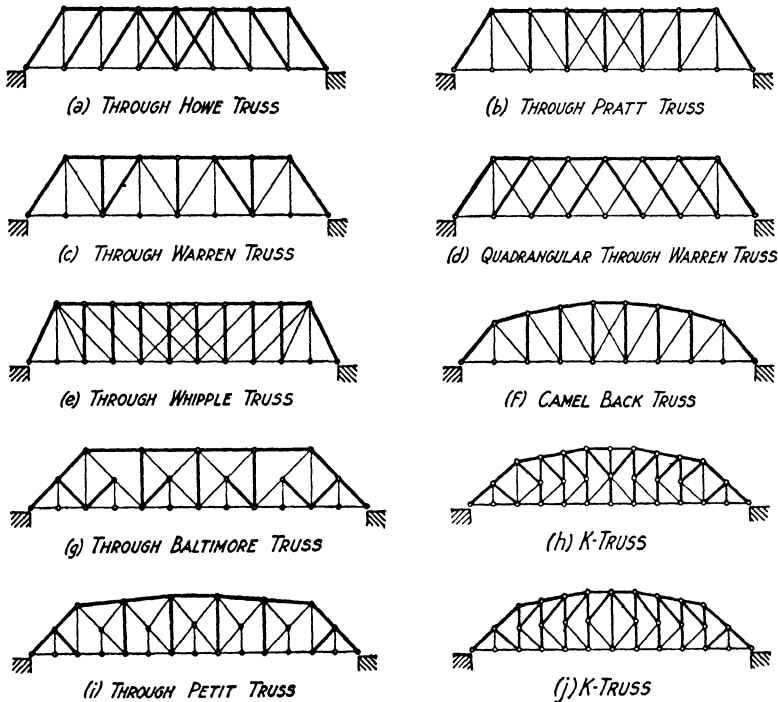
TYPES OF HIGH TRUSS STEEL BRIDGES.
